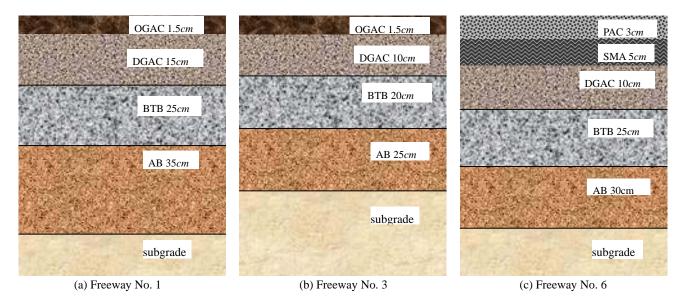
Typical Pavement Structure of Expressways in Taiwan (not to scale).
